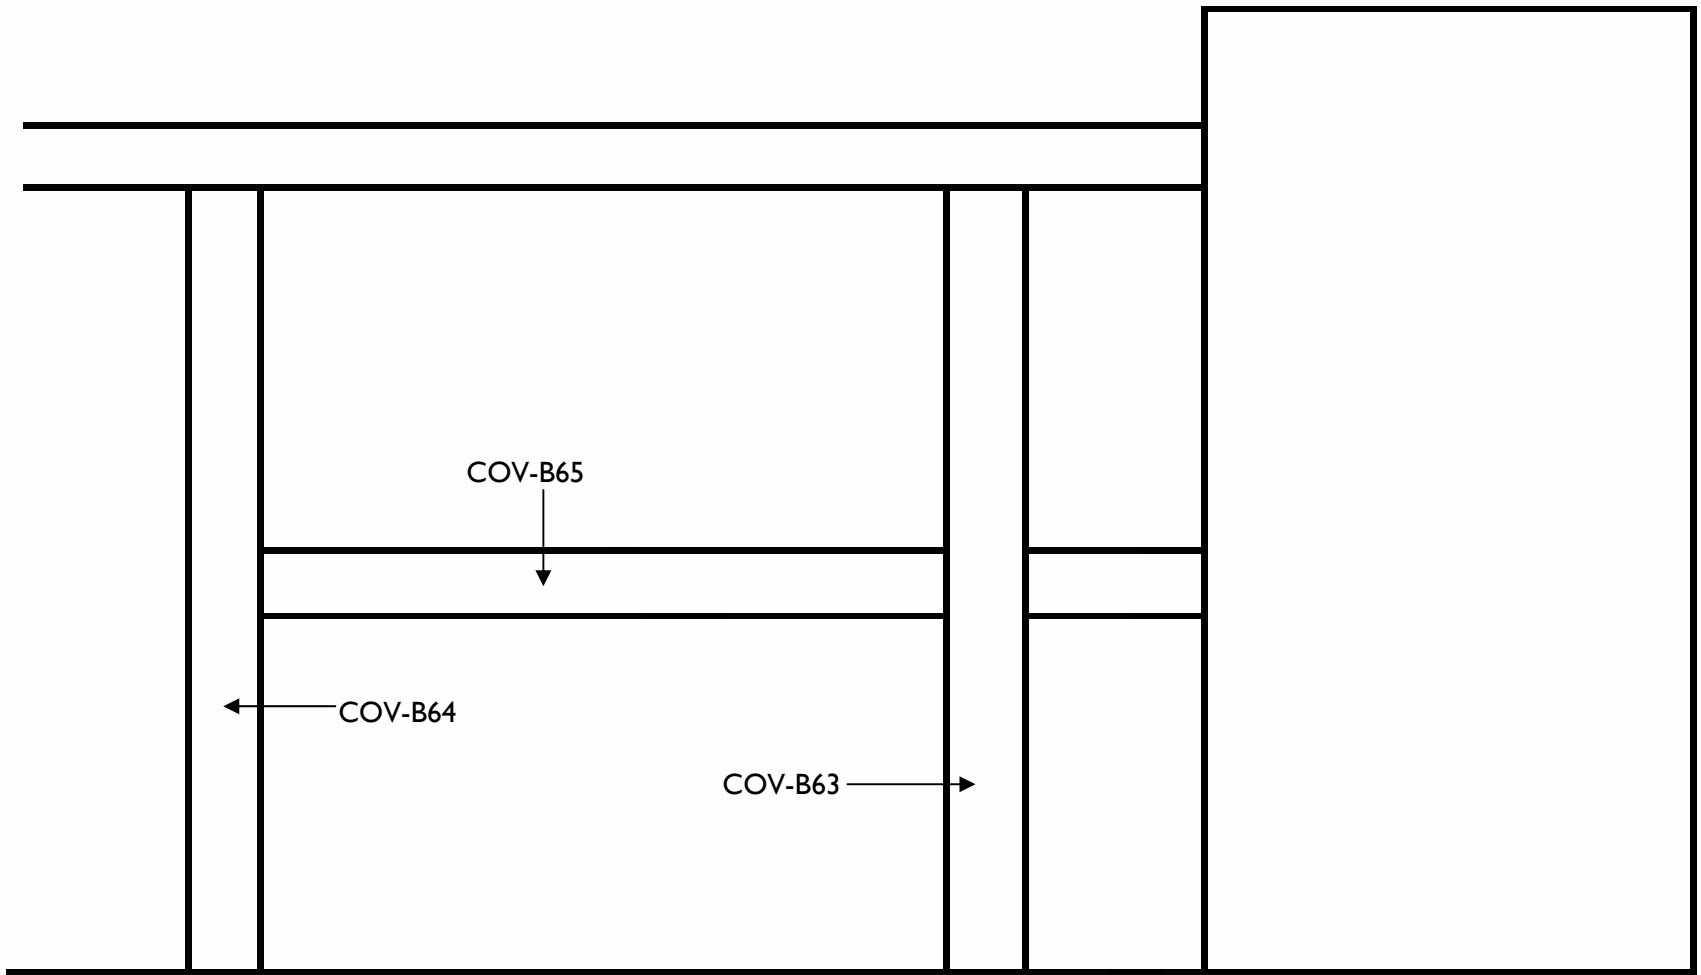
Timber-Framed Range, sketch of first-floor timber-framed partition, showing the location of samples COV-B63–5
